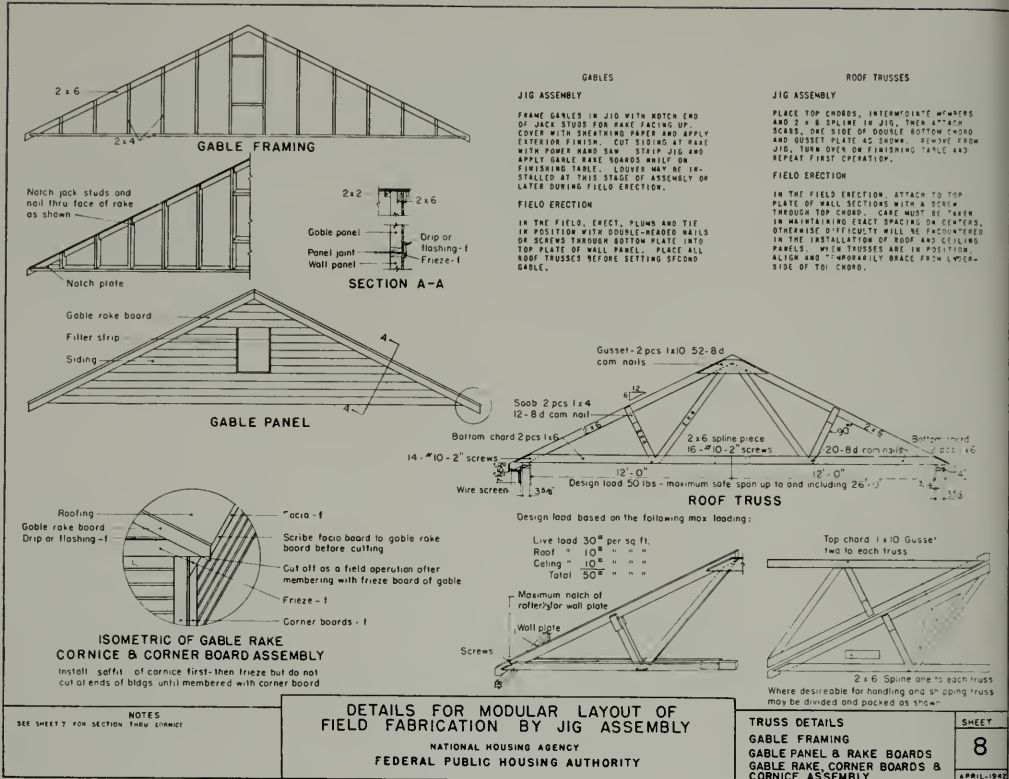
DETAILS FOR MODULAR LAYOUT OF FIELD FABRICATION BY JIG ASSEMBLY
